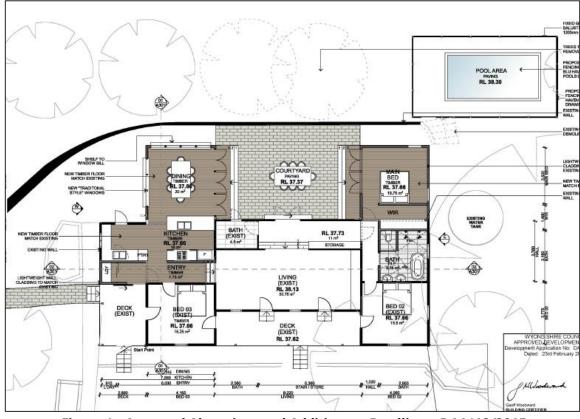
Approved Alterations and Additions to Dwelling - DA1418/2015
